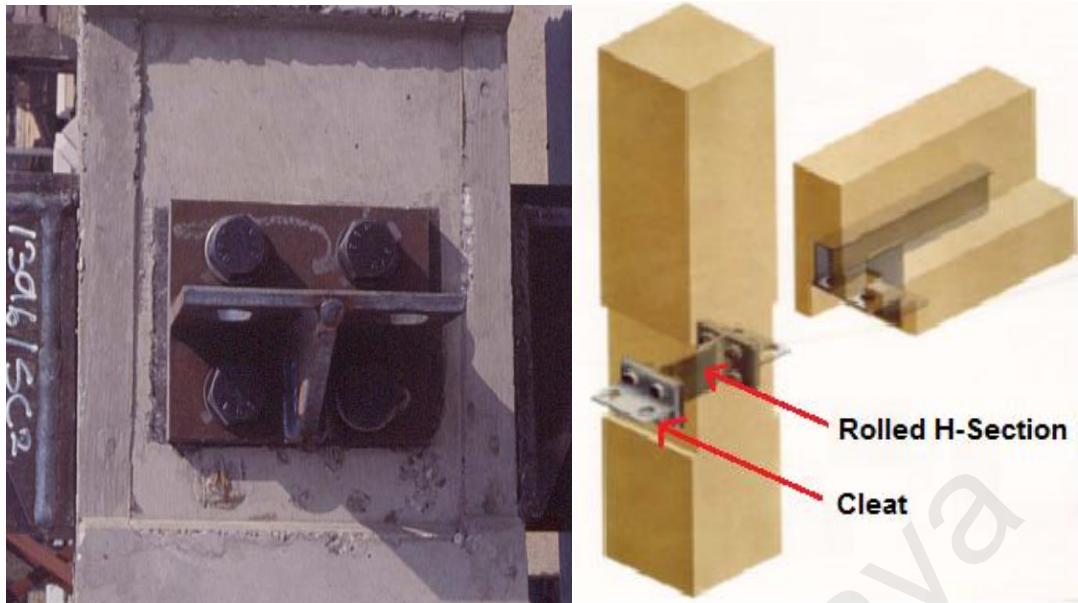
Precast concrete beam to column connection using rolled H-section and bolted on cleat.
